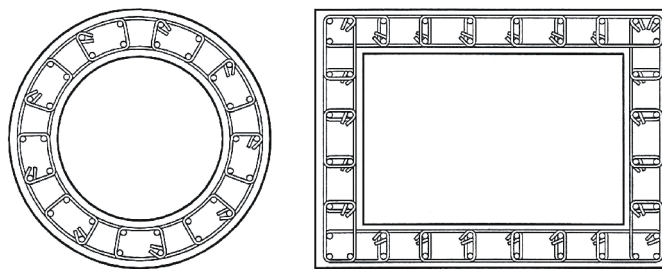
Typical circular (left) and rectangular (right) hollow bridge pier sections [3].
